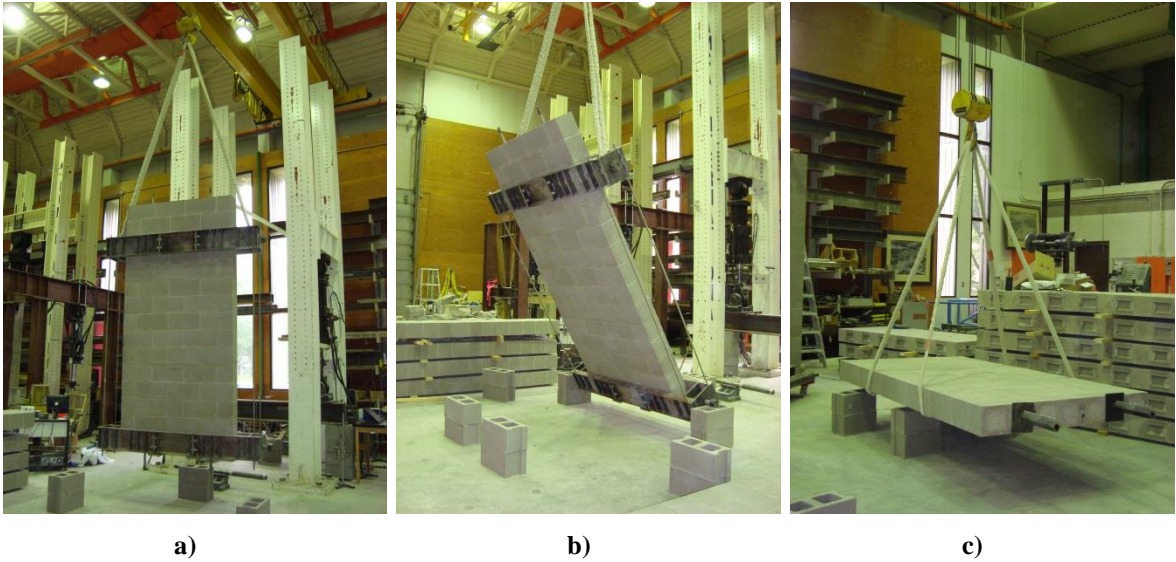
Transportation of wall splice specimens: a) specimen translation, b) rotating of specimen, and c) positioning of specimen in test frame
